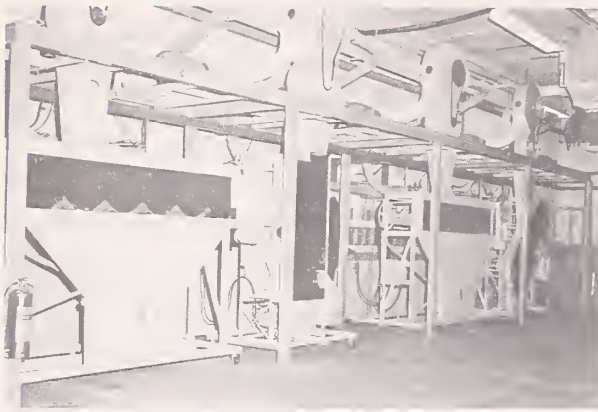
Seed-cotton cleaning machinery in the bay arrangement.
